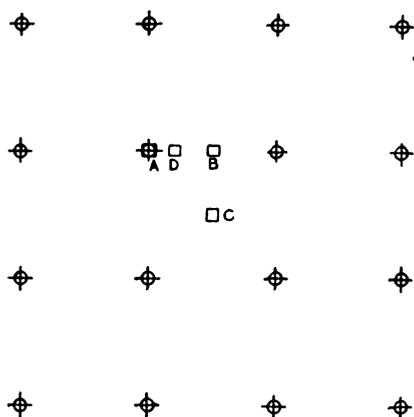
TYPICAL PLAN OF DISTRIBUTED UNIT SYSTEM.
